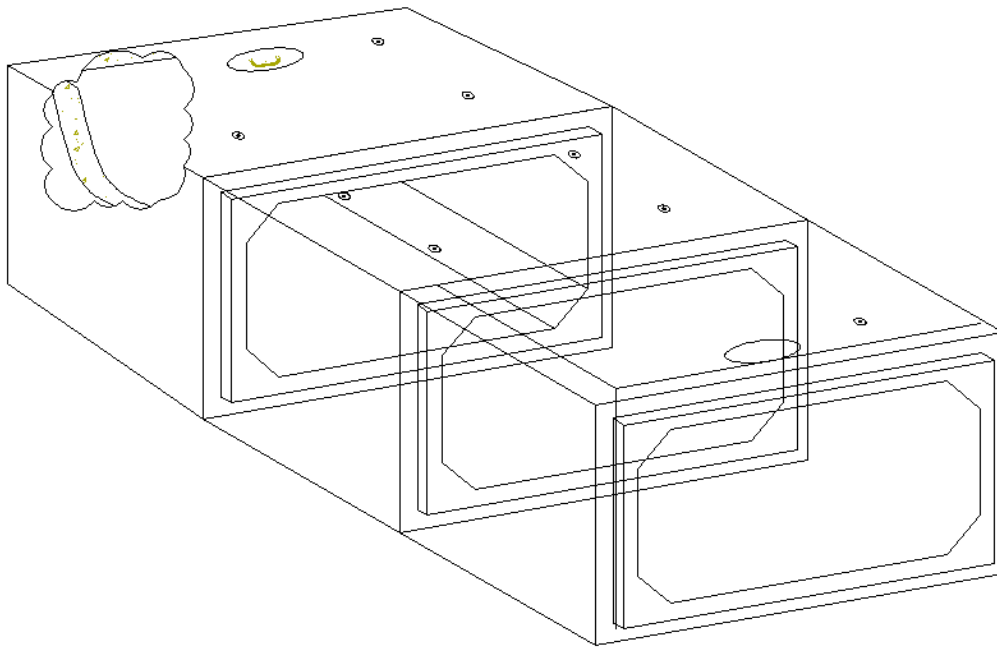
2.6 x 3.7m Underground culvert/Tunnel
